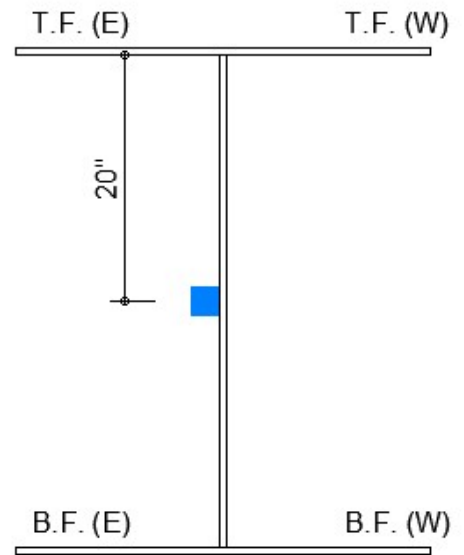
Installation Plan of Long-Term and Short-Term Sensor
